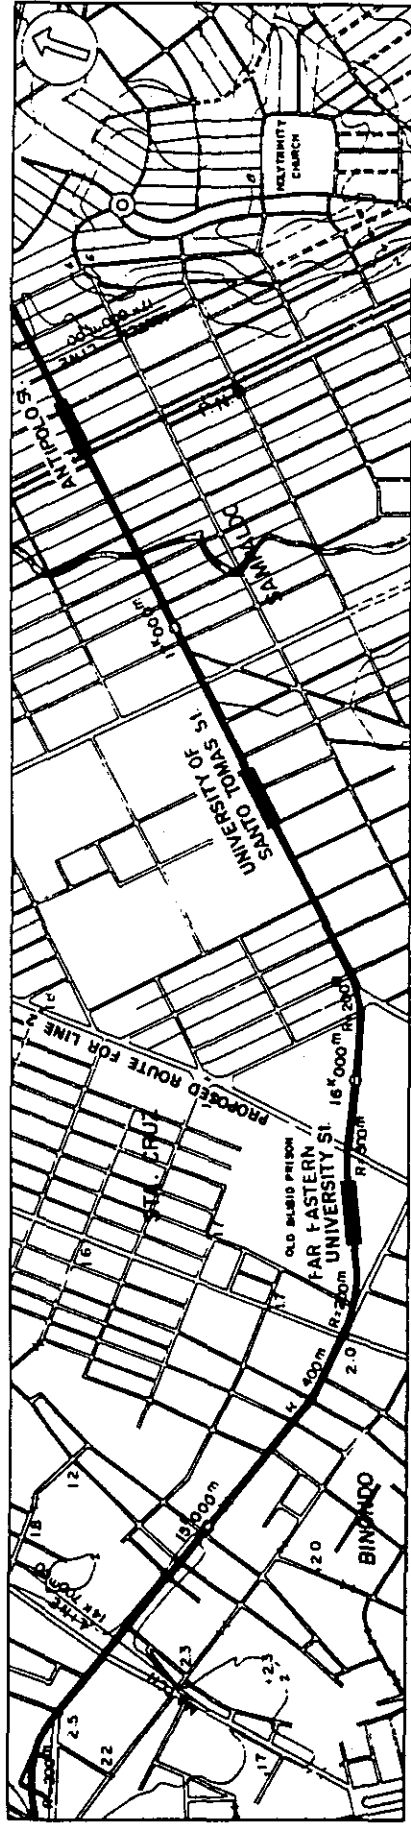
Plan and Profile of Recommended Alternative (5)
